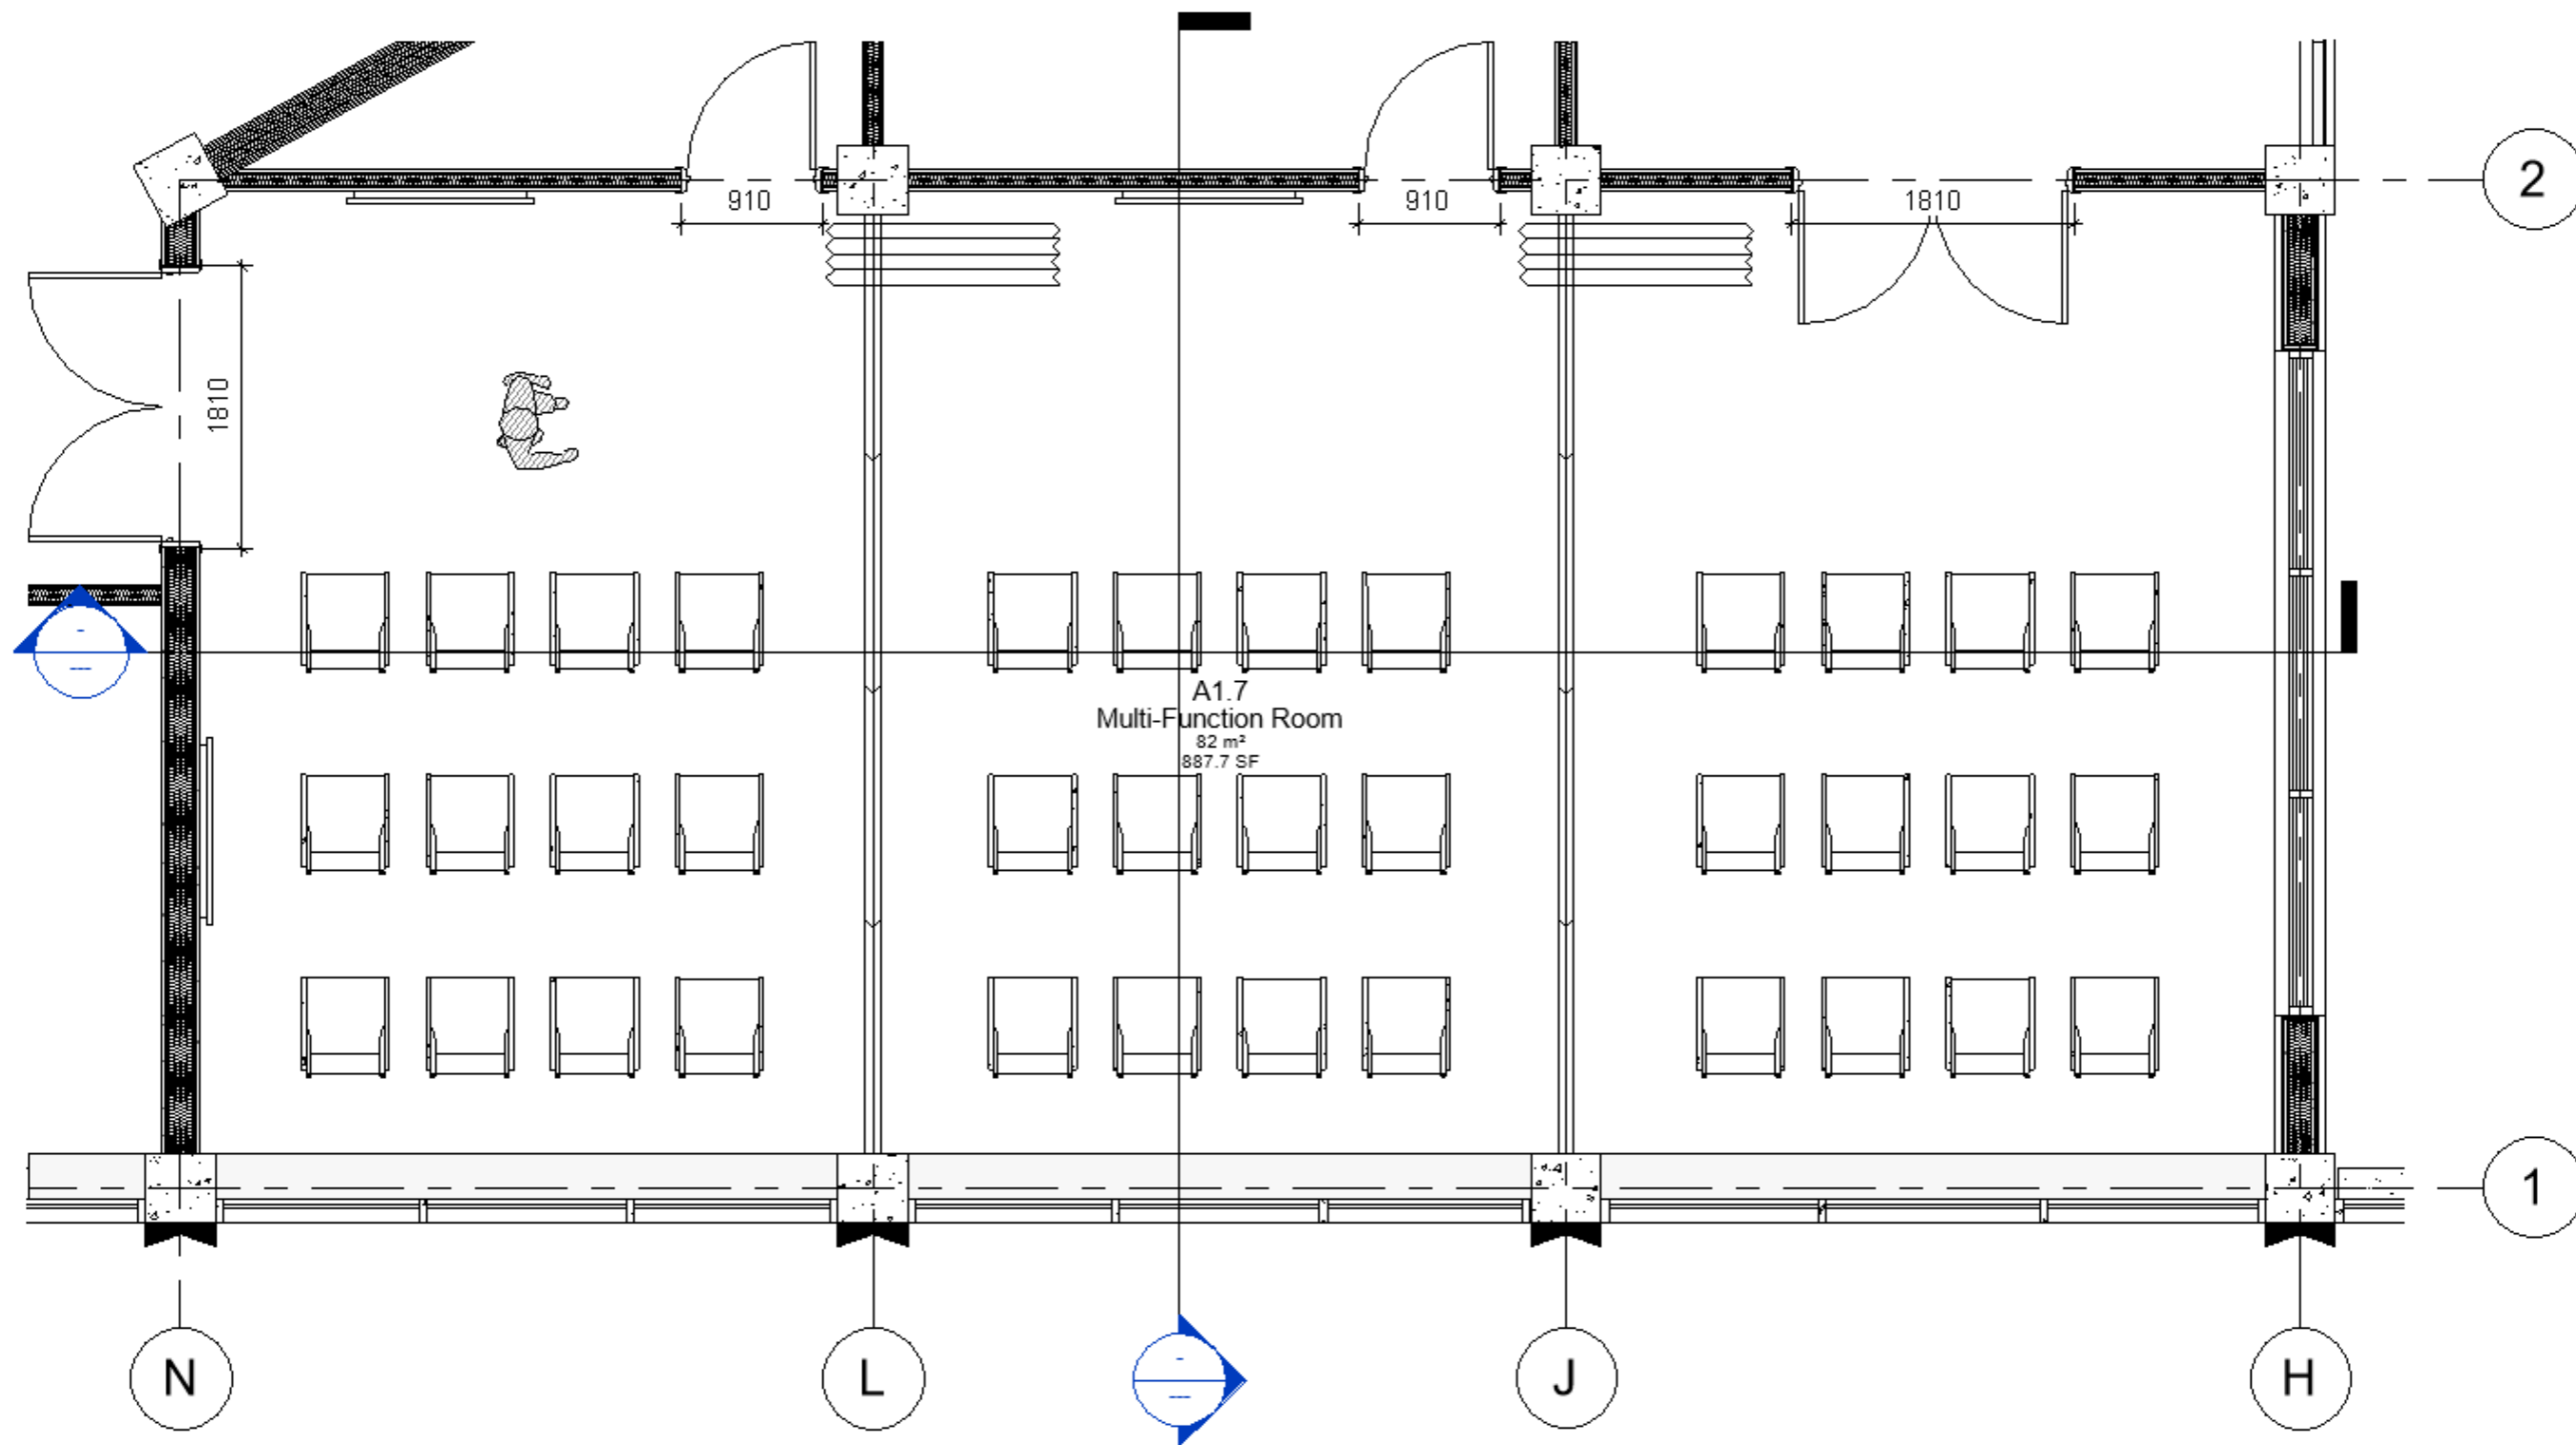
Enlarged Multi-Function Room Plan (Author, 2021)
